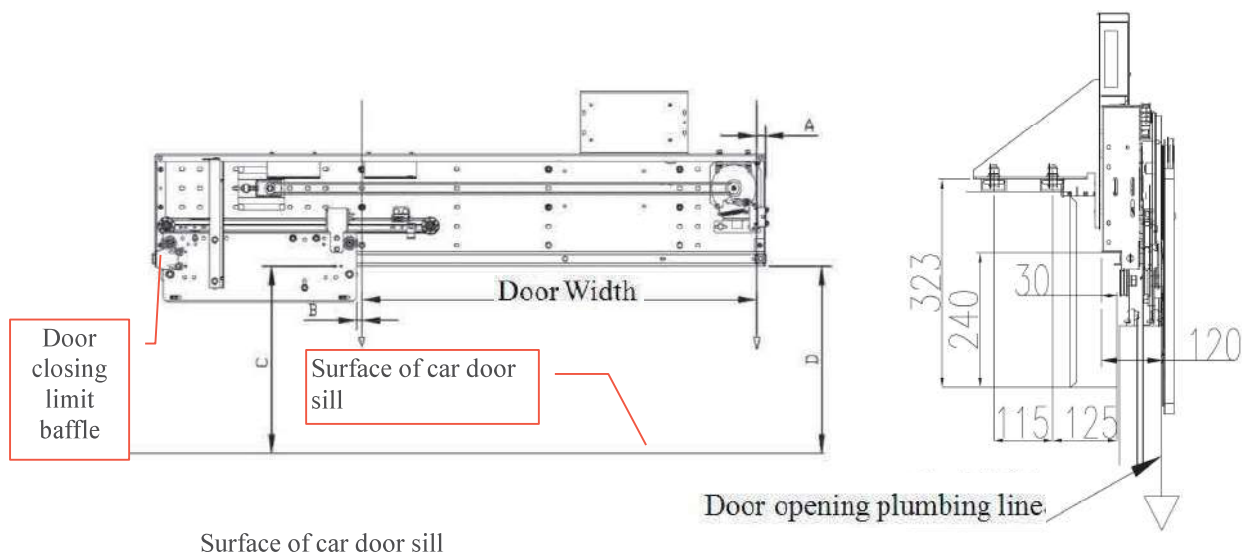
Adjust hanging components (2 Panels side opening doors)
